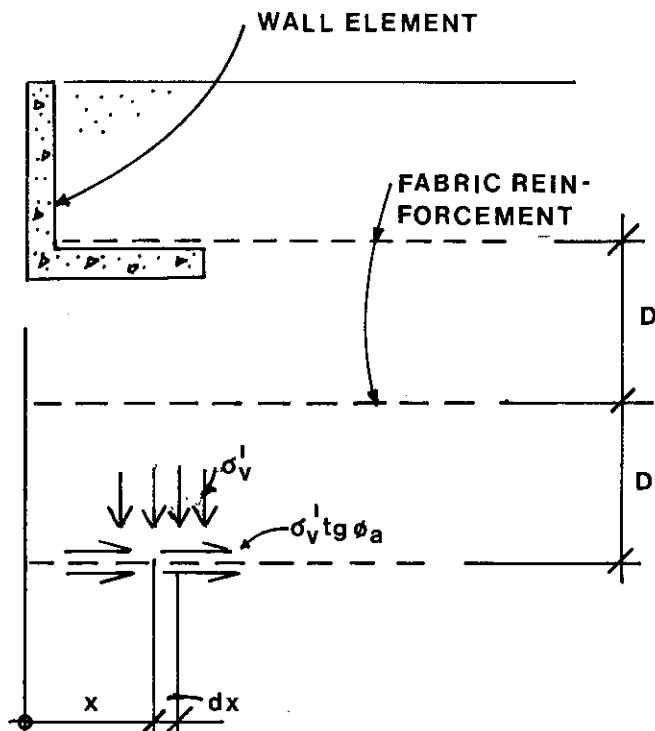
Stress distribution behind a retaining wall reinforced with fabric.
